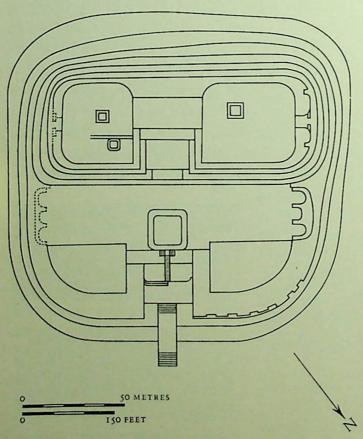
Moxeke, platform-temple, ninth century B.C. (?). Plan
